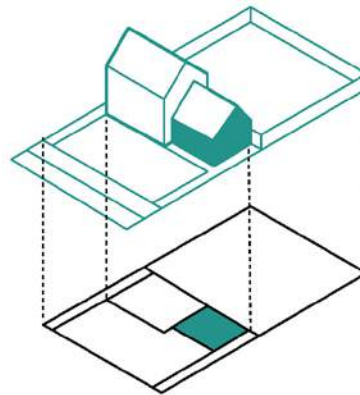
An acceptable example of a side extension which is single storey and set back from the main building line, with a roof form that responds to the original building.
